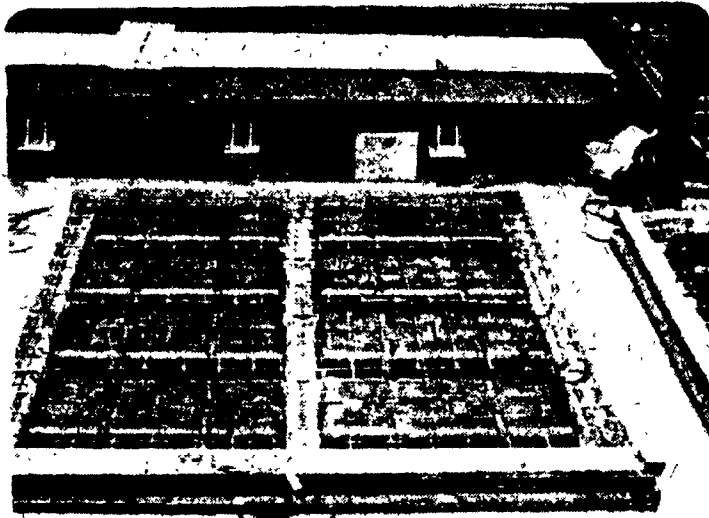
MOULD AND REINFORCEMENT IN PLACE FOR
